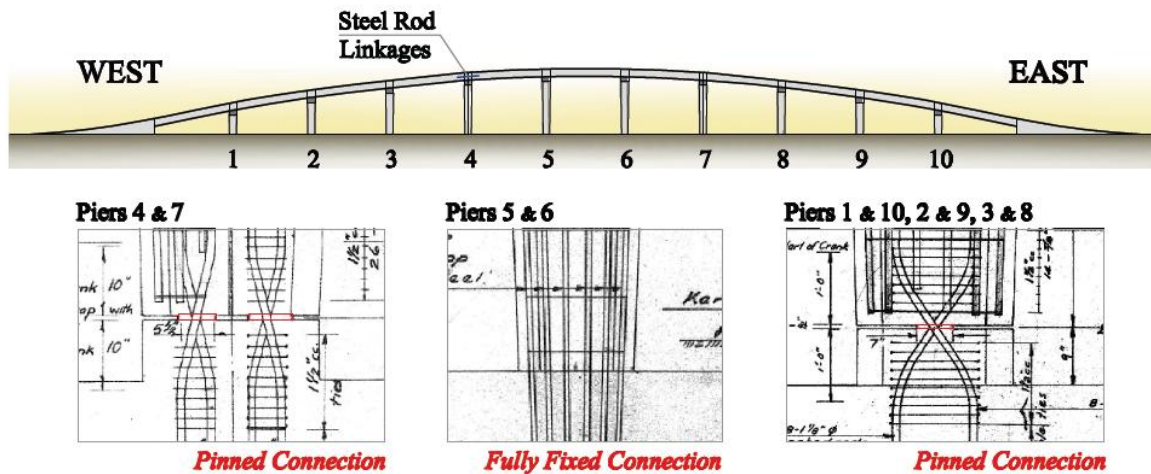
Sketch of the bridge with the details of the connections between the piers and the footings
